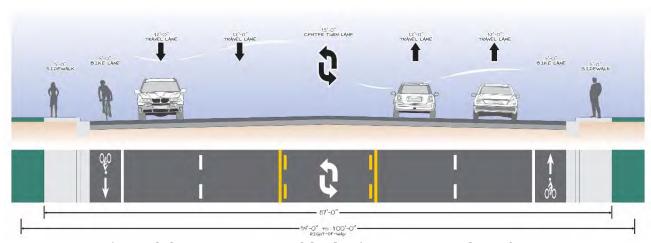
East Butler Road SCDOT APPR Proposed Cross Section
